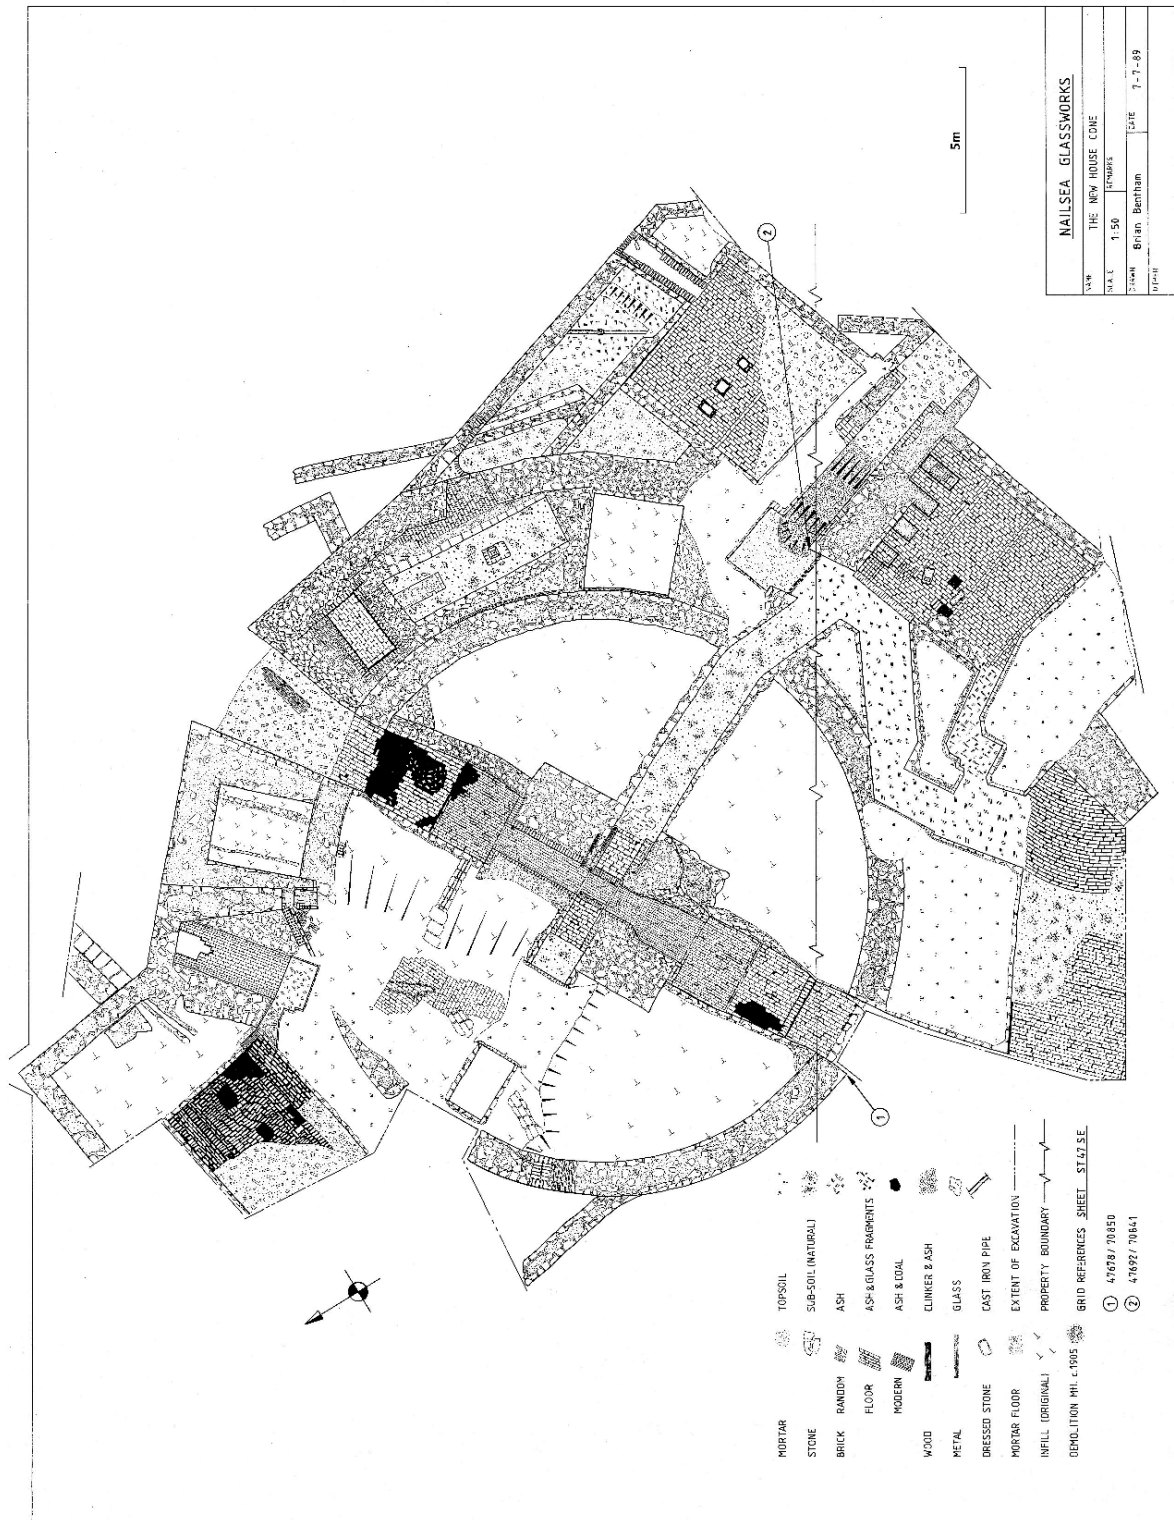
1989 Plan of the New House Cone, as excavated (B Bentham)
